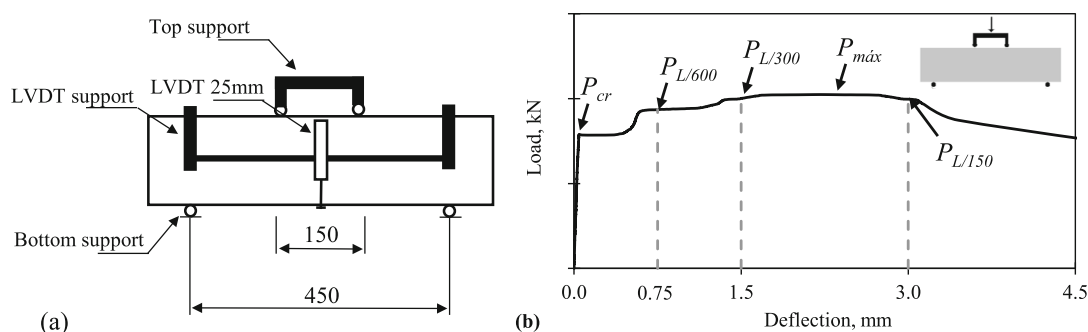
Four-point bending test—4PBT: a setup (dimensions in mm), b parameters established by ASTM C-1609 [16]
